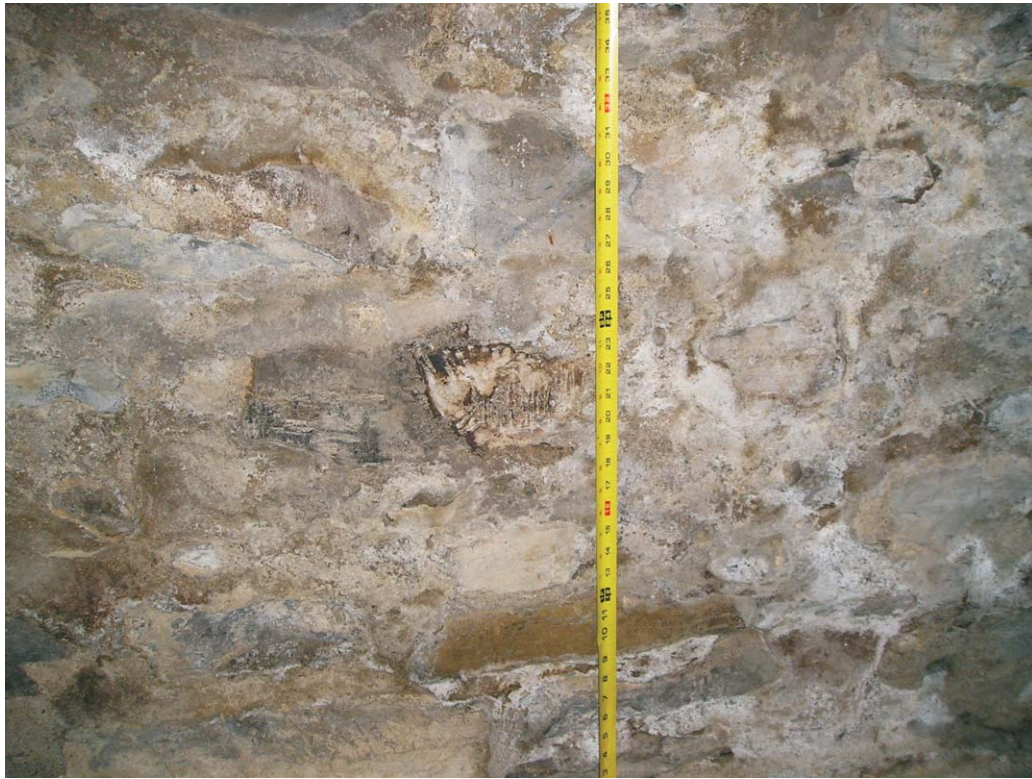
Stone #1 after sampling located approximately 2 feet above the basement floor.
